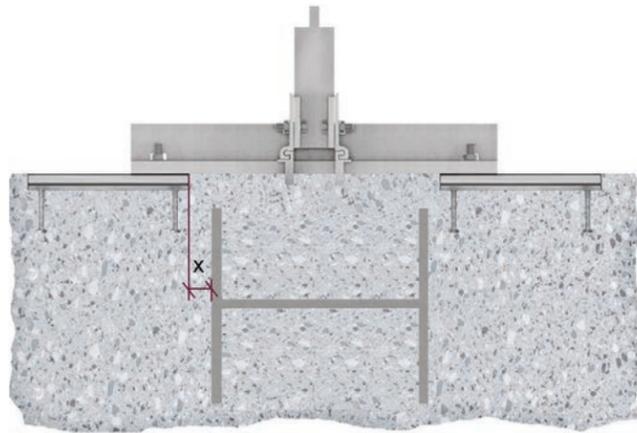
FOS With Column Conflict — Section View.
